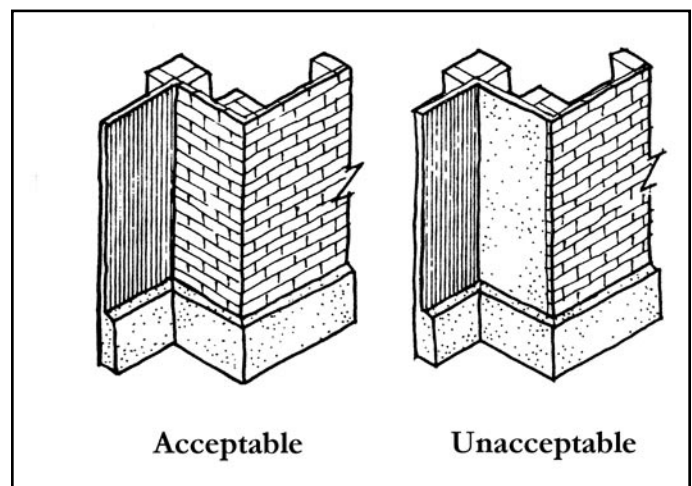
Examples of acceptable and unacceptable changes in exterior wall materials
